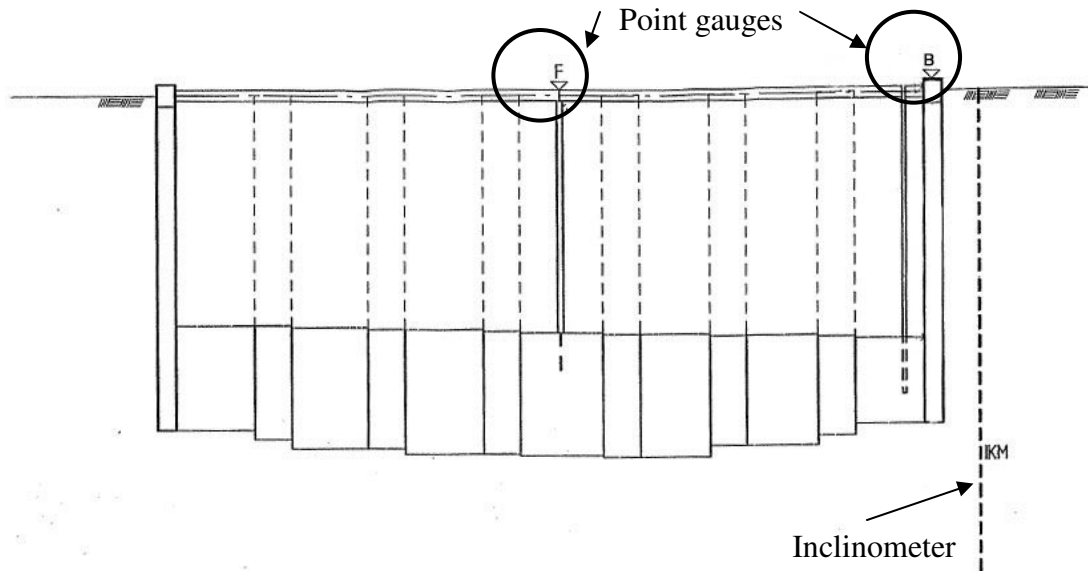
Placing of in situ measuring equipment, i.e. inclinometers and point-gauges, at the studied section. [24]
